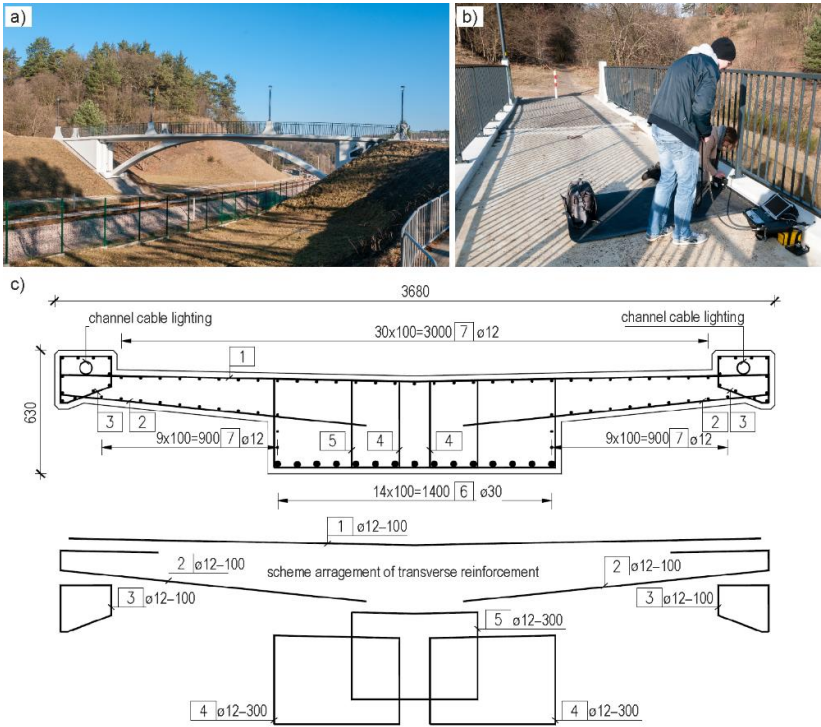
Considered reinforced concrete pedestrian bridge (Gdańsk, Poland, 54°21'32.4"N 18°34'01.8"E): (a) general view; (b) deck during GPR measurements; (c) cross-section of the bridge with reinforcement drawing (dimensions in mm)
